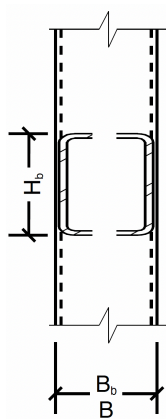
Branch Wall Effective Width for Plastic Section Modulus
